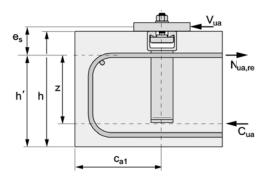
ANCHOR REINFORCEMENT TO RESIST SHEAR LOADS
